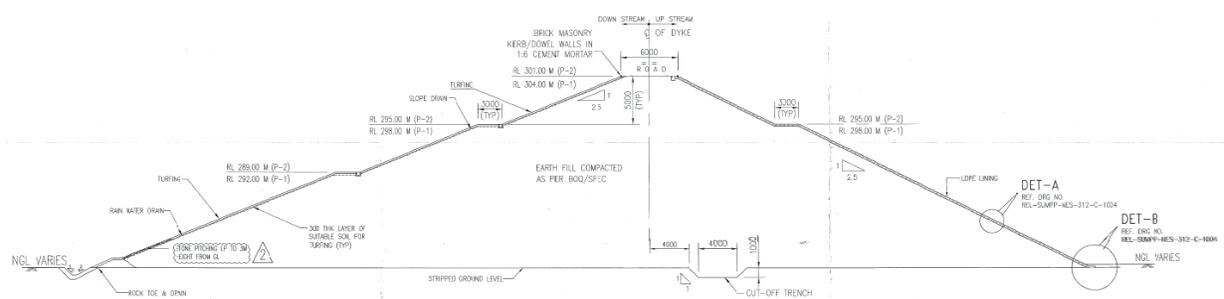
A typical cross-section of dyke of Ash Pond (Scale: 1:200)
